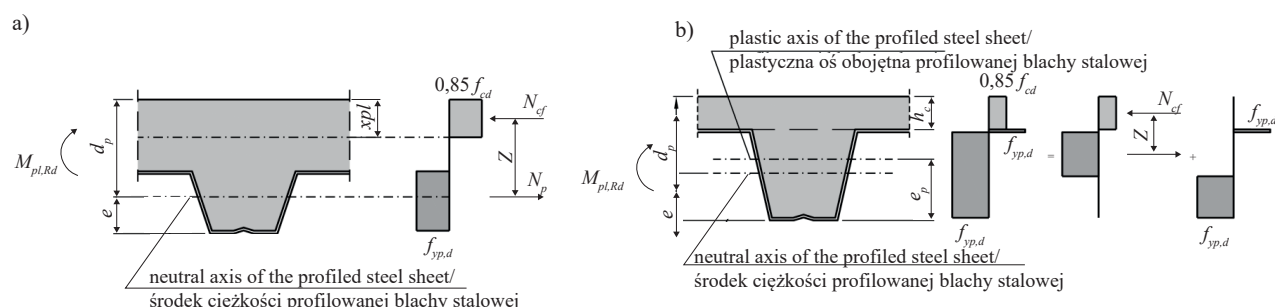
Stress distribution under a positive bending moment: a) neutral axis above the profiled steel sheet, without additional reinforcement in the rib; b) neutral axis within the profiled steel sheet
